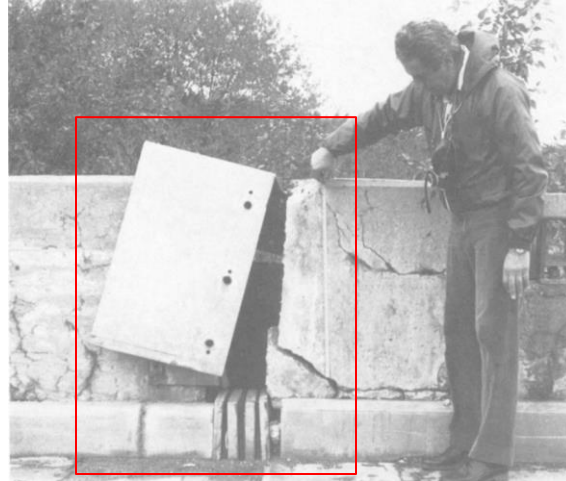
Damage to concrete cover at Kenogani abutment, adopted from (Filiatrault et al., 1993)
